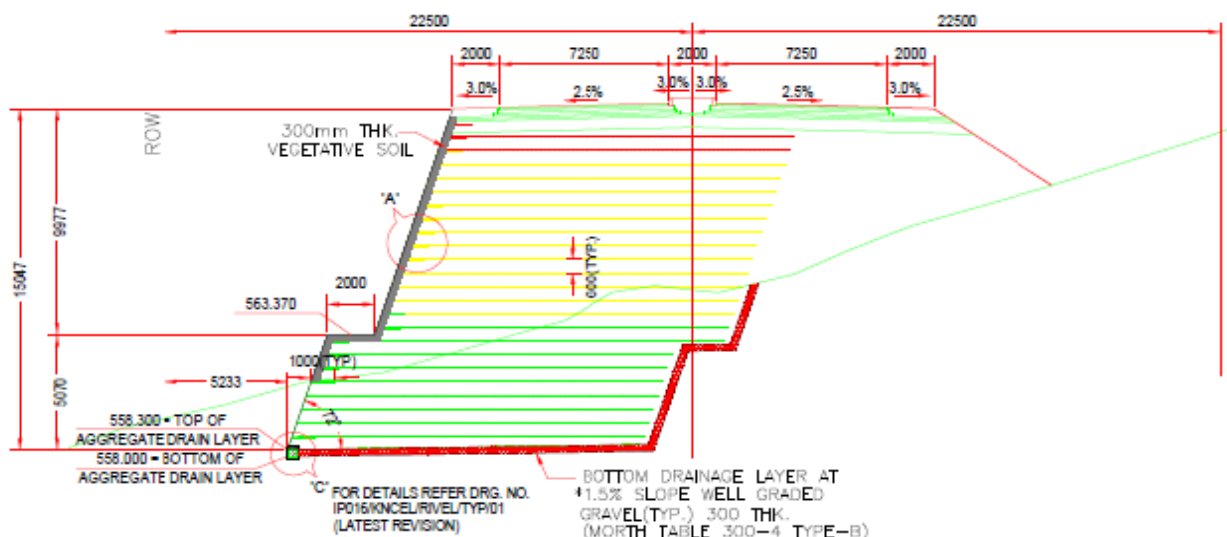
Represents the Cross Section of the RS wall at Chainage 18+640 to 18+650 Km
